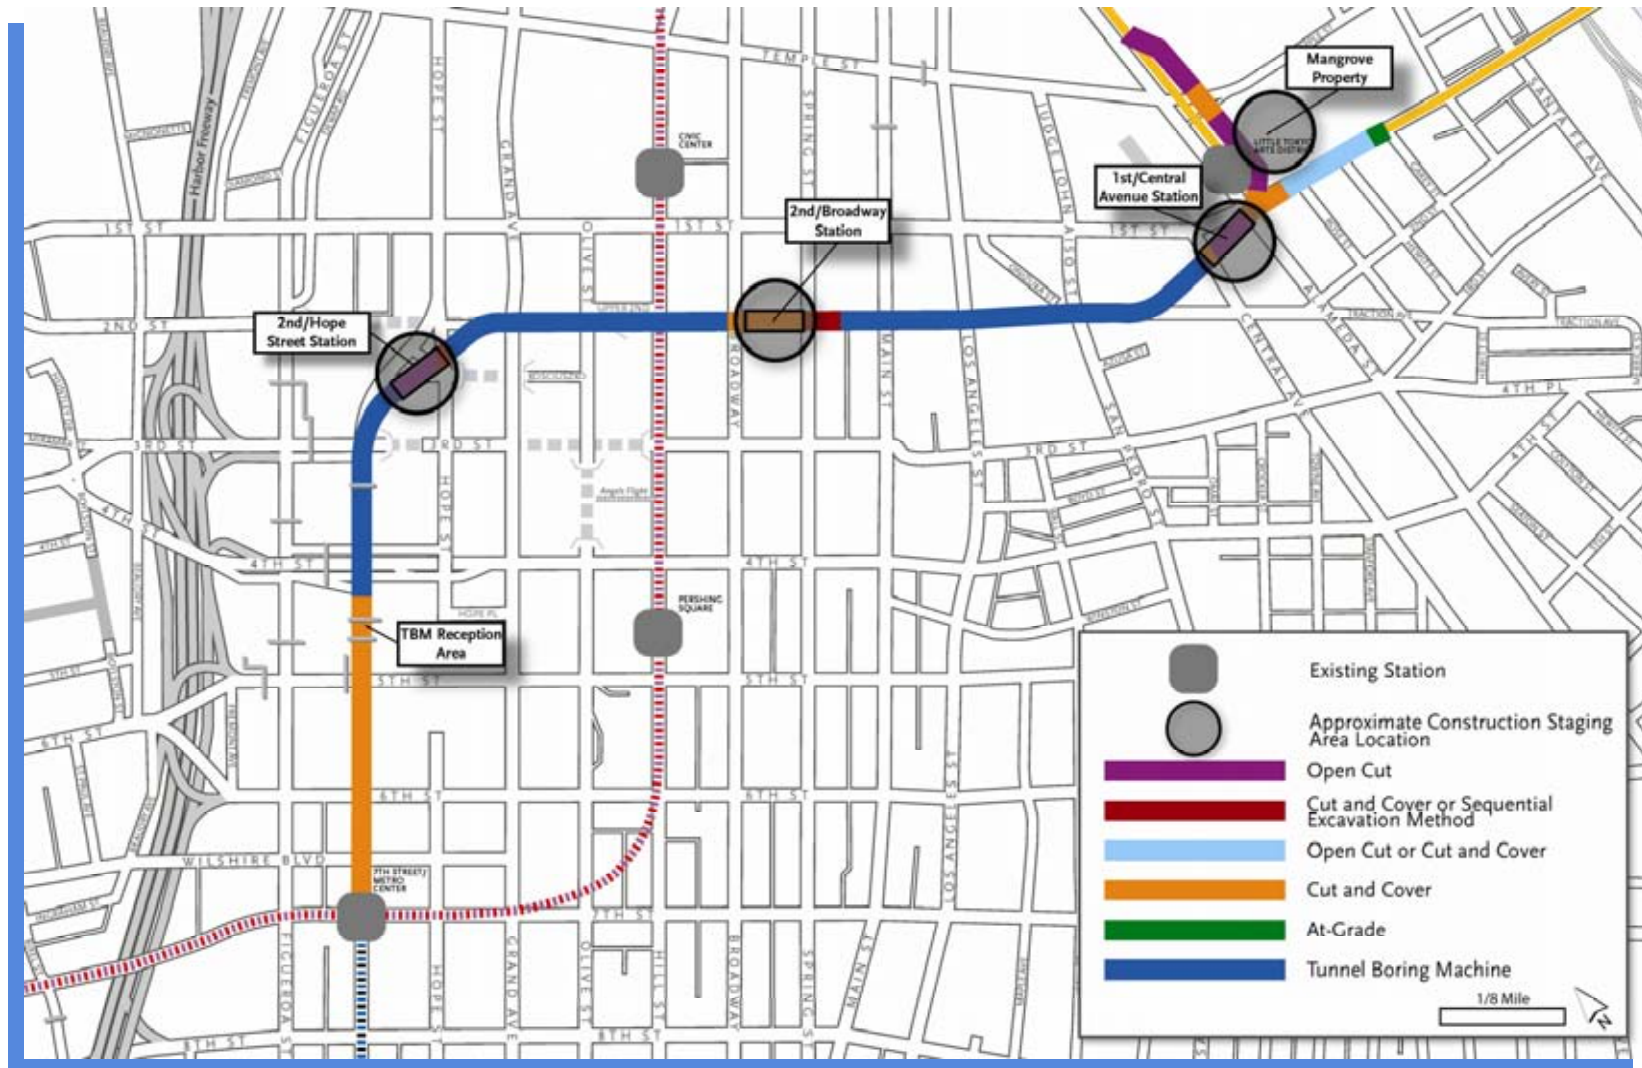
Locally Preferred Alternative Construction Methods
